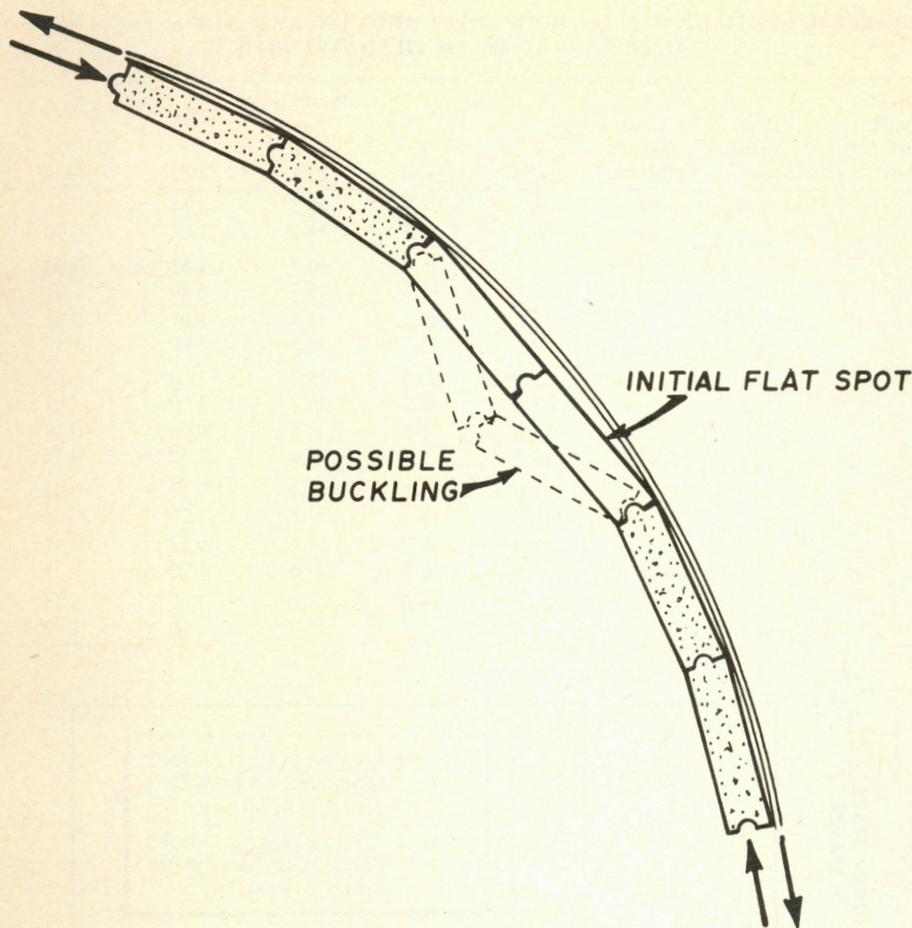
Local buckling failure of a stave tower silo wall due to wind loading.
